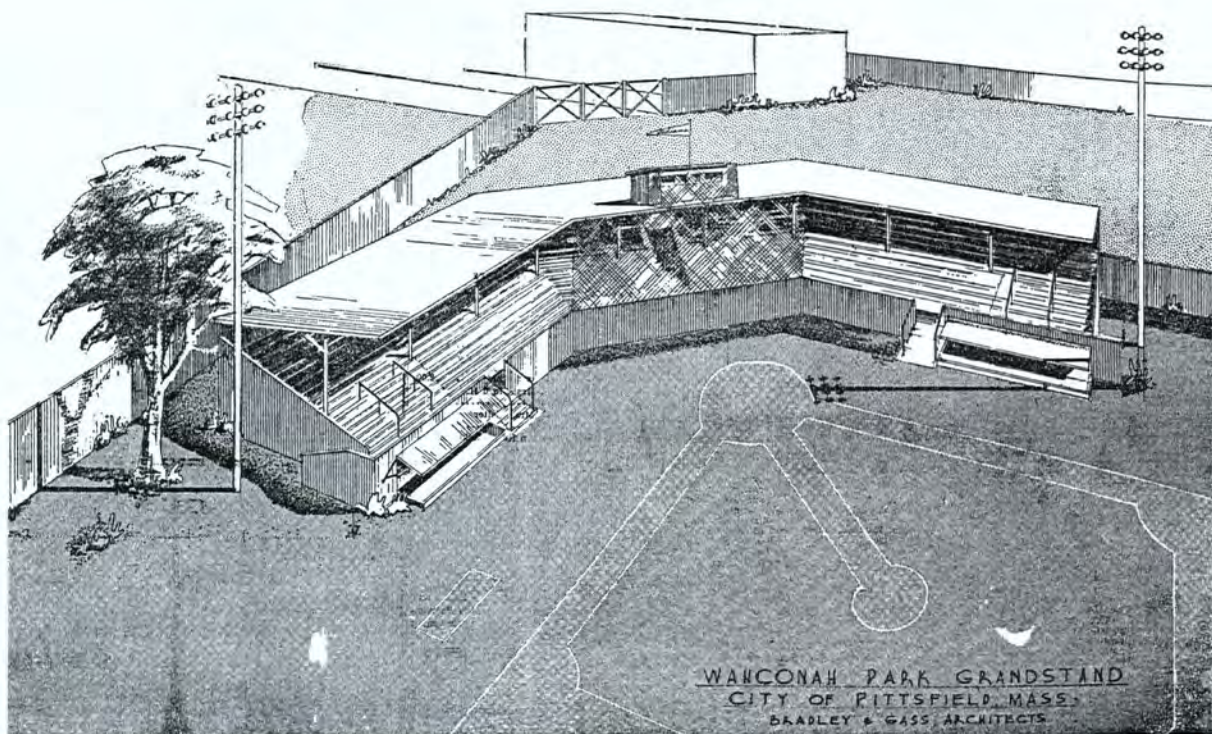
Architects' sketch of c.1950 Wahconah Park grandstand.¹
